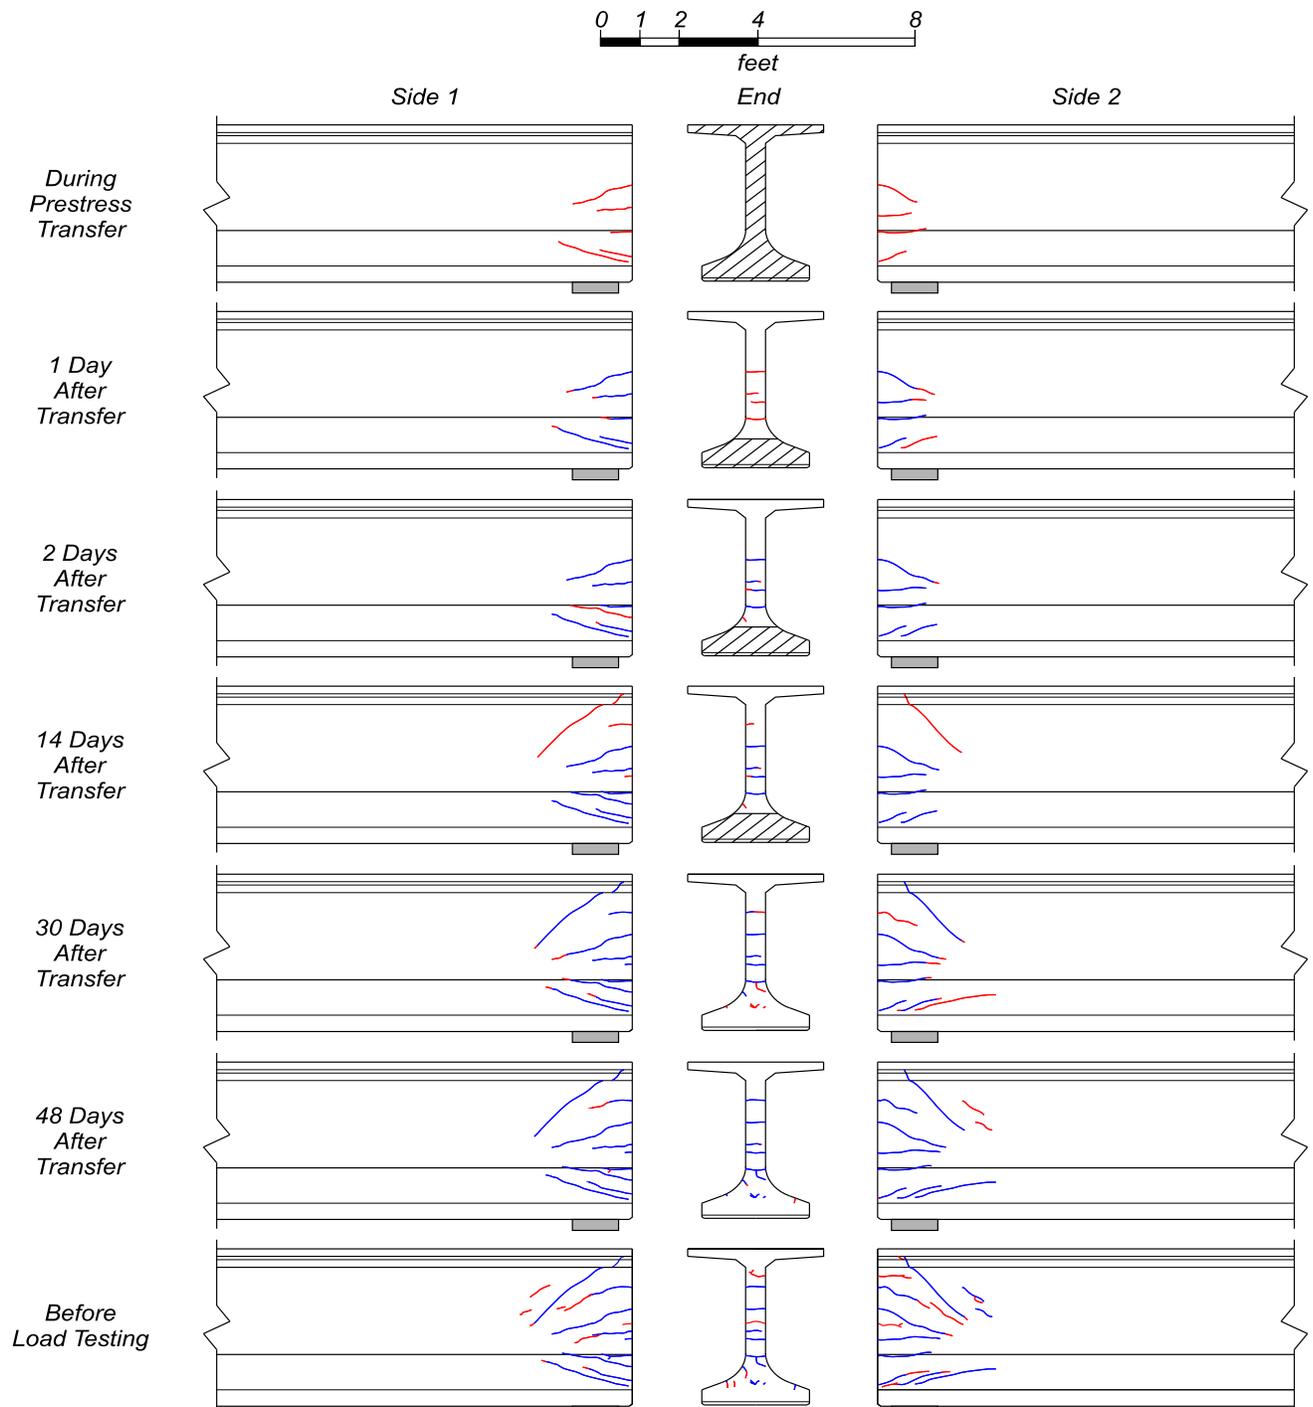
Crack growth in specimen LB (flexural cracks in top flange not shown)
